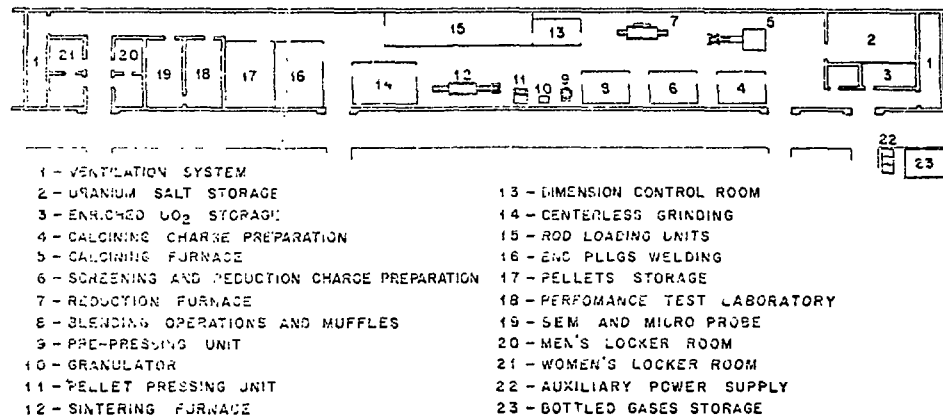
Pilot plant layout (area 1300 sq. m)
